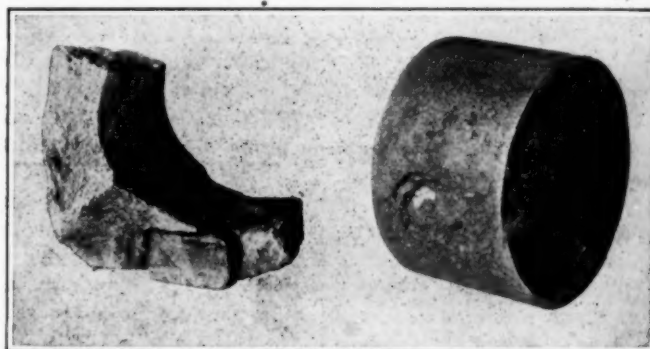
Failure of a Pipe Line by Corrosion Due to Faulty Concrete Protection
